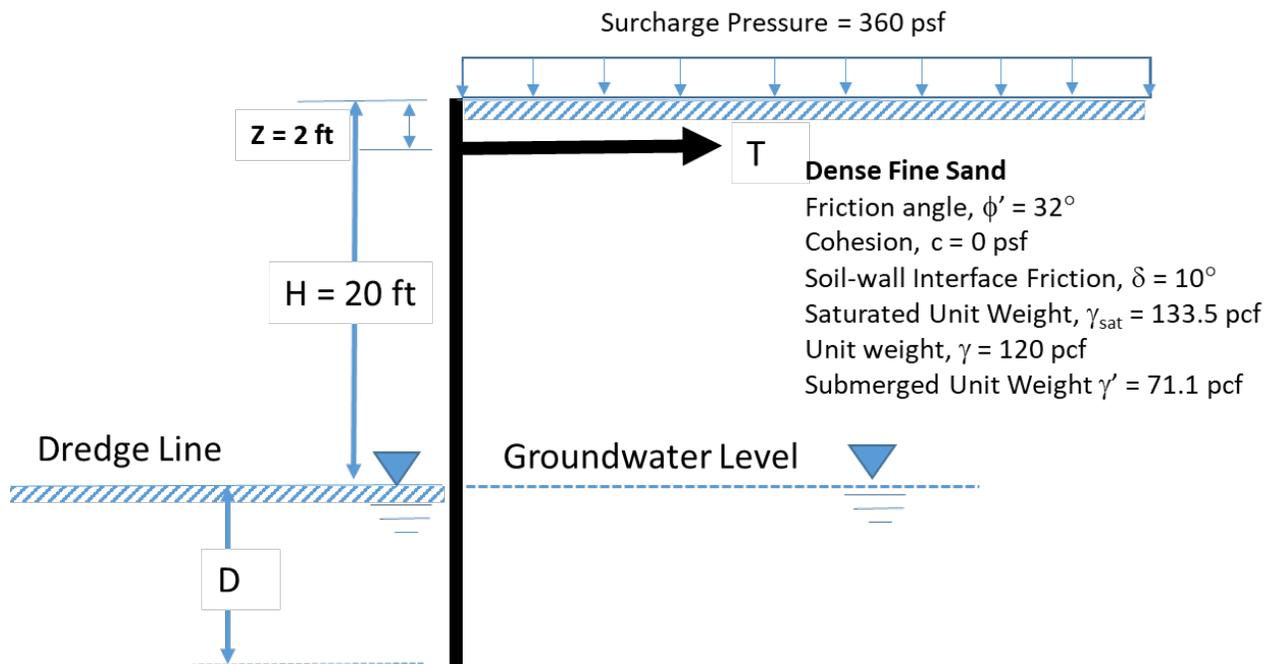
Case 4 Anchored cantilever wall in cohesionless soil.
